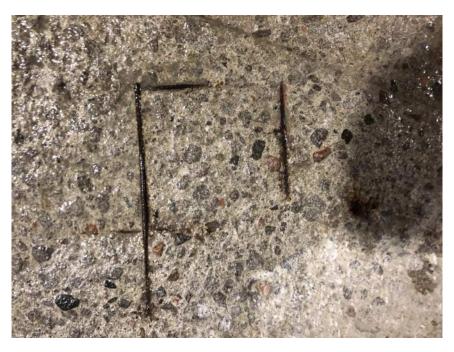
| Cracking of Existing Concrete Slab along the Southwest Corner of the Ice Rink
